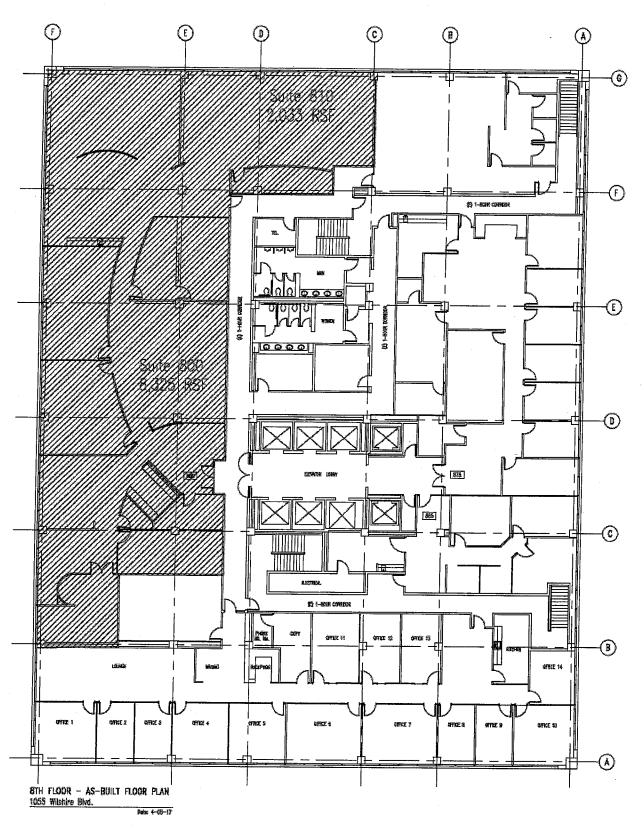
EXHIBIT A - Page 1 FLOOR PLAN OF PREMISES
